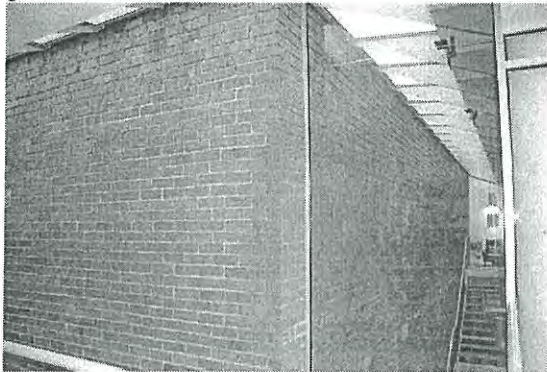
Exterior, Call Room, view of north and east elevations now largely enclosed by the new University of Ballarat building.
